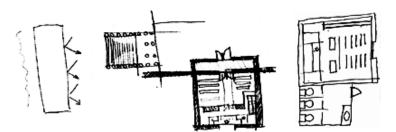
Diagrams to illustrate using thick walls to reduce sound transmission included 1) a simple rectangle to represent a thick wall, 2) detailed floor plan configuration, and 3) concepts not from text (restrooms).
